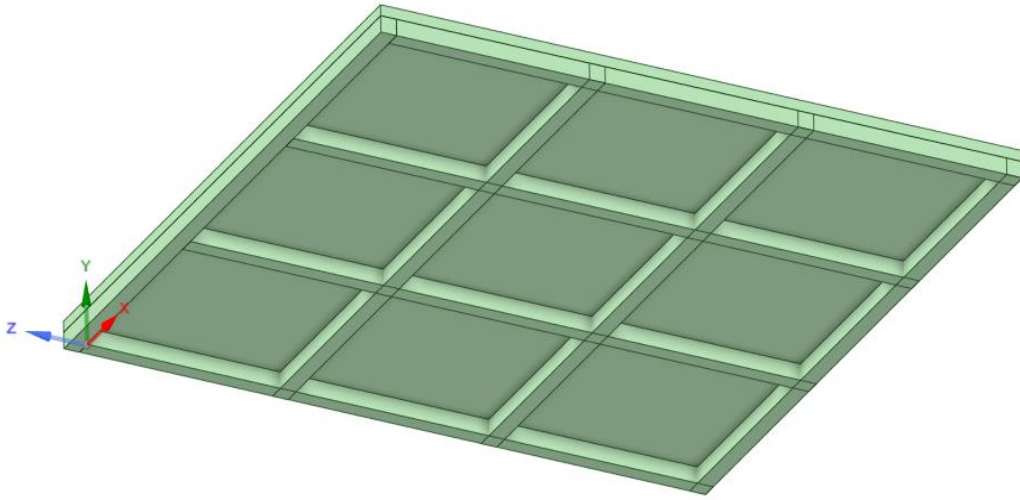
Geometrical Drawing of Panels with The Beams for The Slab.
